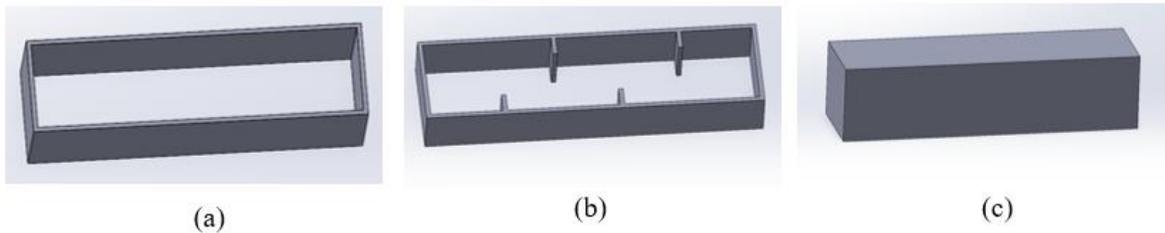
Prepared 3D printing models a) Printed formwork b) Printed studs formwork c) Fully printed
